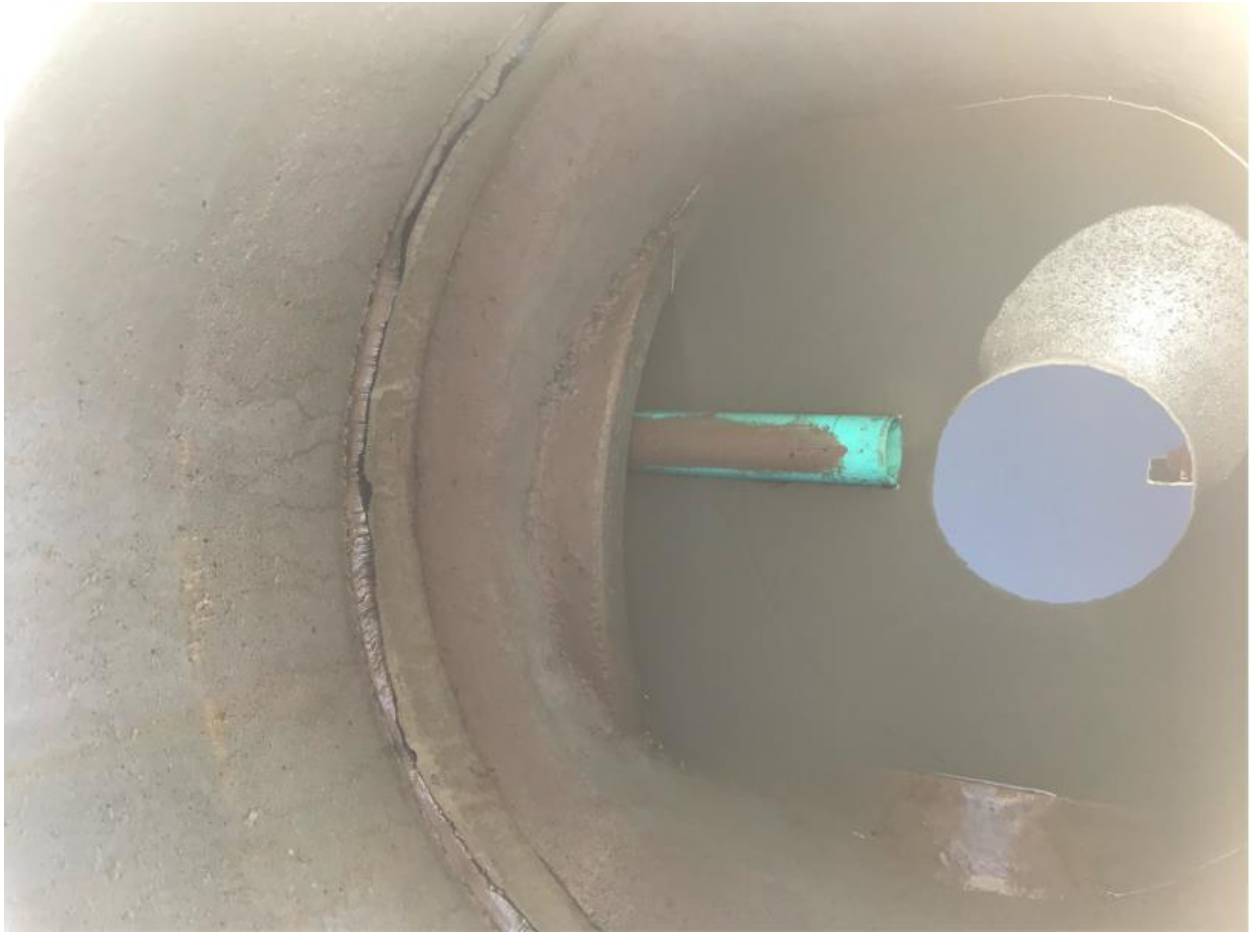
Uncapped 4-inch pipe within a manhole on Site (referenced in Map 1 as either Municipal Storm Drain: North Connection or South Connection). The 4-inch pipe leads to the City of Santa Rosa's public storm drain system. Note the sediment deposition on top of the 4-inch pipe and the pooling water near the bottom rim of the 4-inch pipe. (Photo provided by City staff Nick Sudano on October 29, 2021. Photo taken by City staff Javier Fernandez on October 28, 2021 as part of his City Inspection Report).
